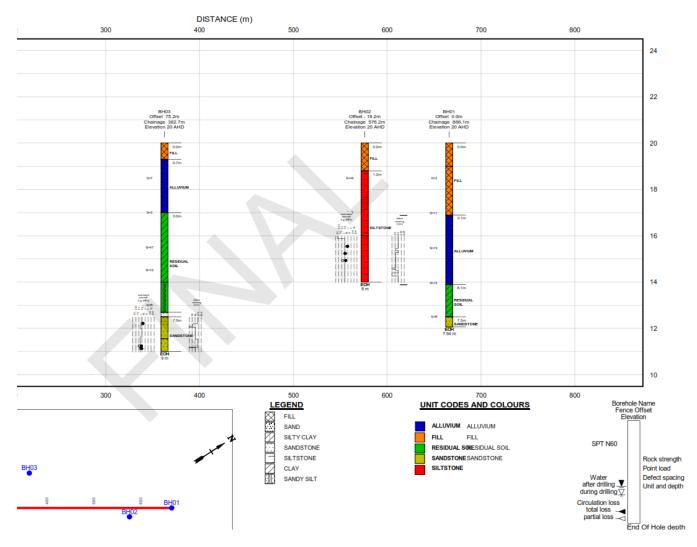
Geotechnical cross section of BH01-BH03 (AECOM, 2016) showing alluvial sand deposits (dark blue) within BH01 and BH03
